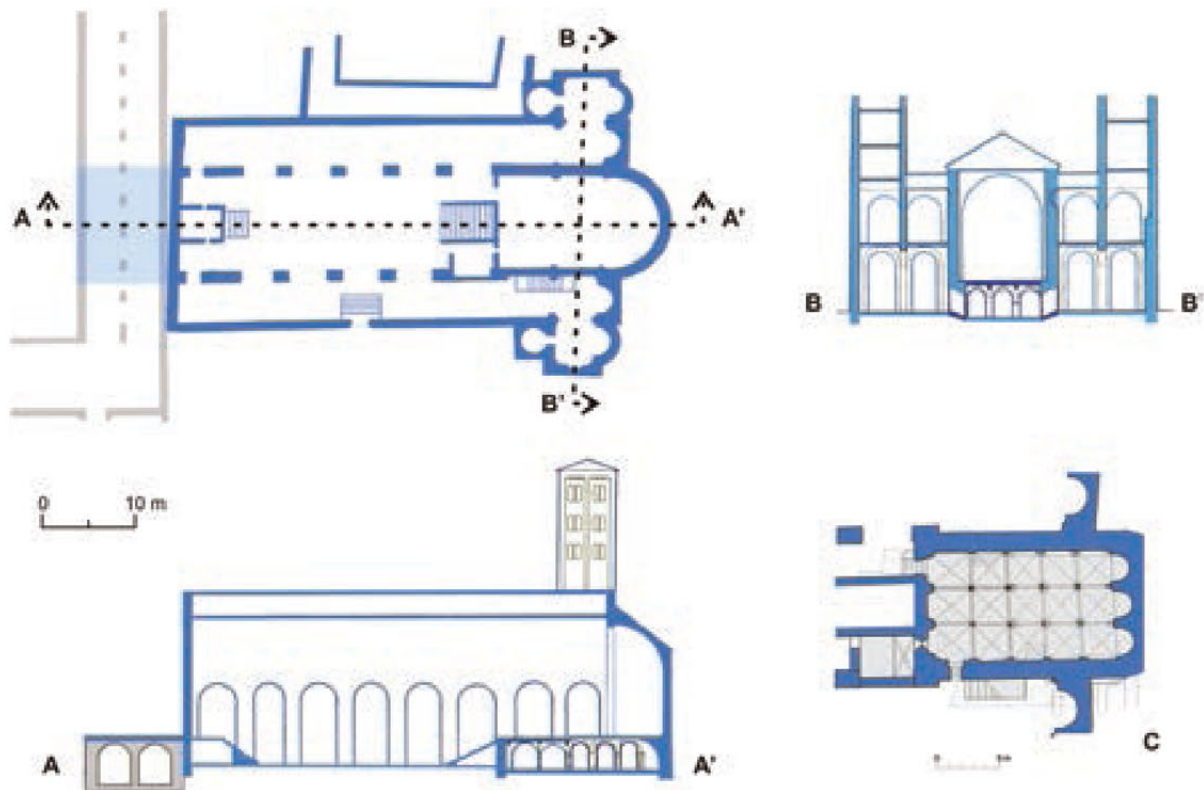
Aosta (I), cathedral in 1031: plan, sections and plan of the crypt (C) (drawings Mauro CORTELAZZO & Renato PERINETTI)
